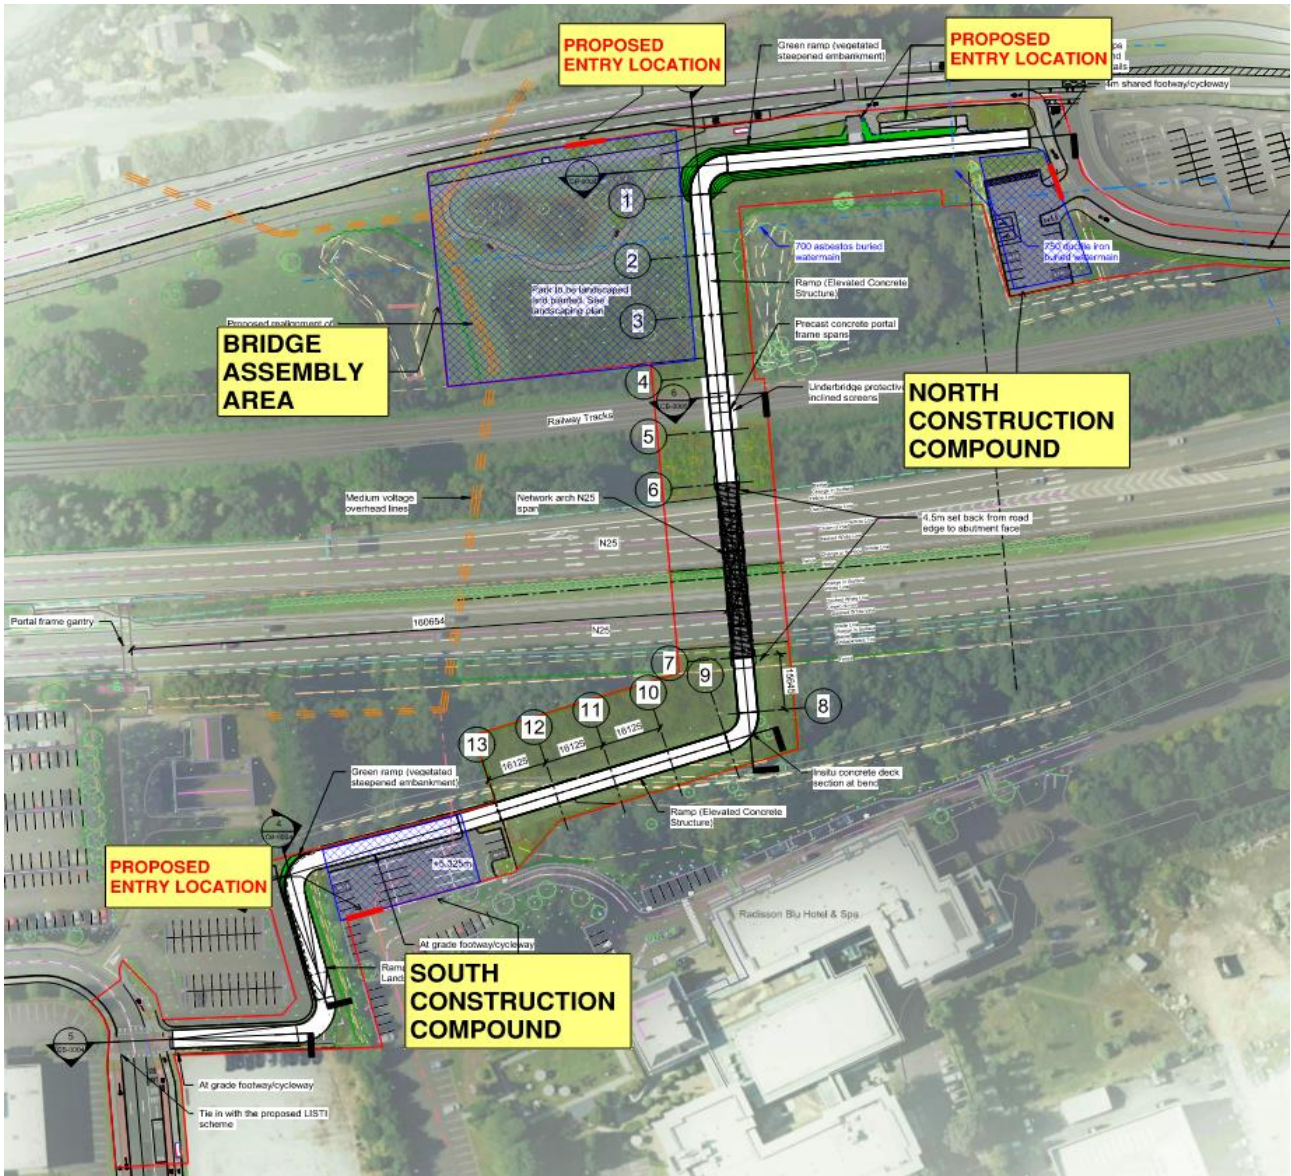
Extract of Proposed Development site layout, illustrating proposed construction compounds and bridge assembly compound.
